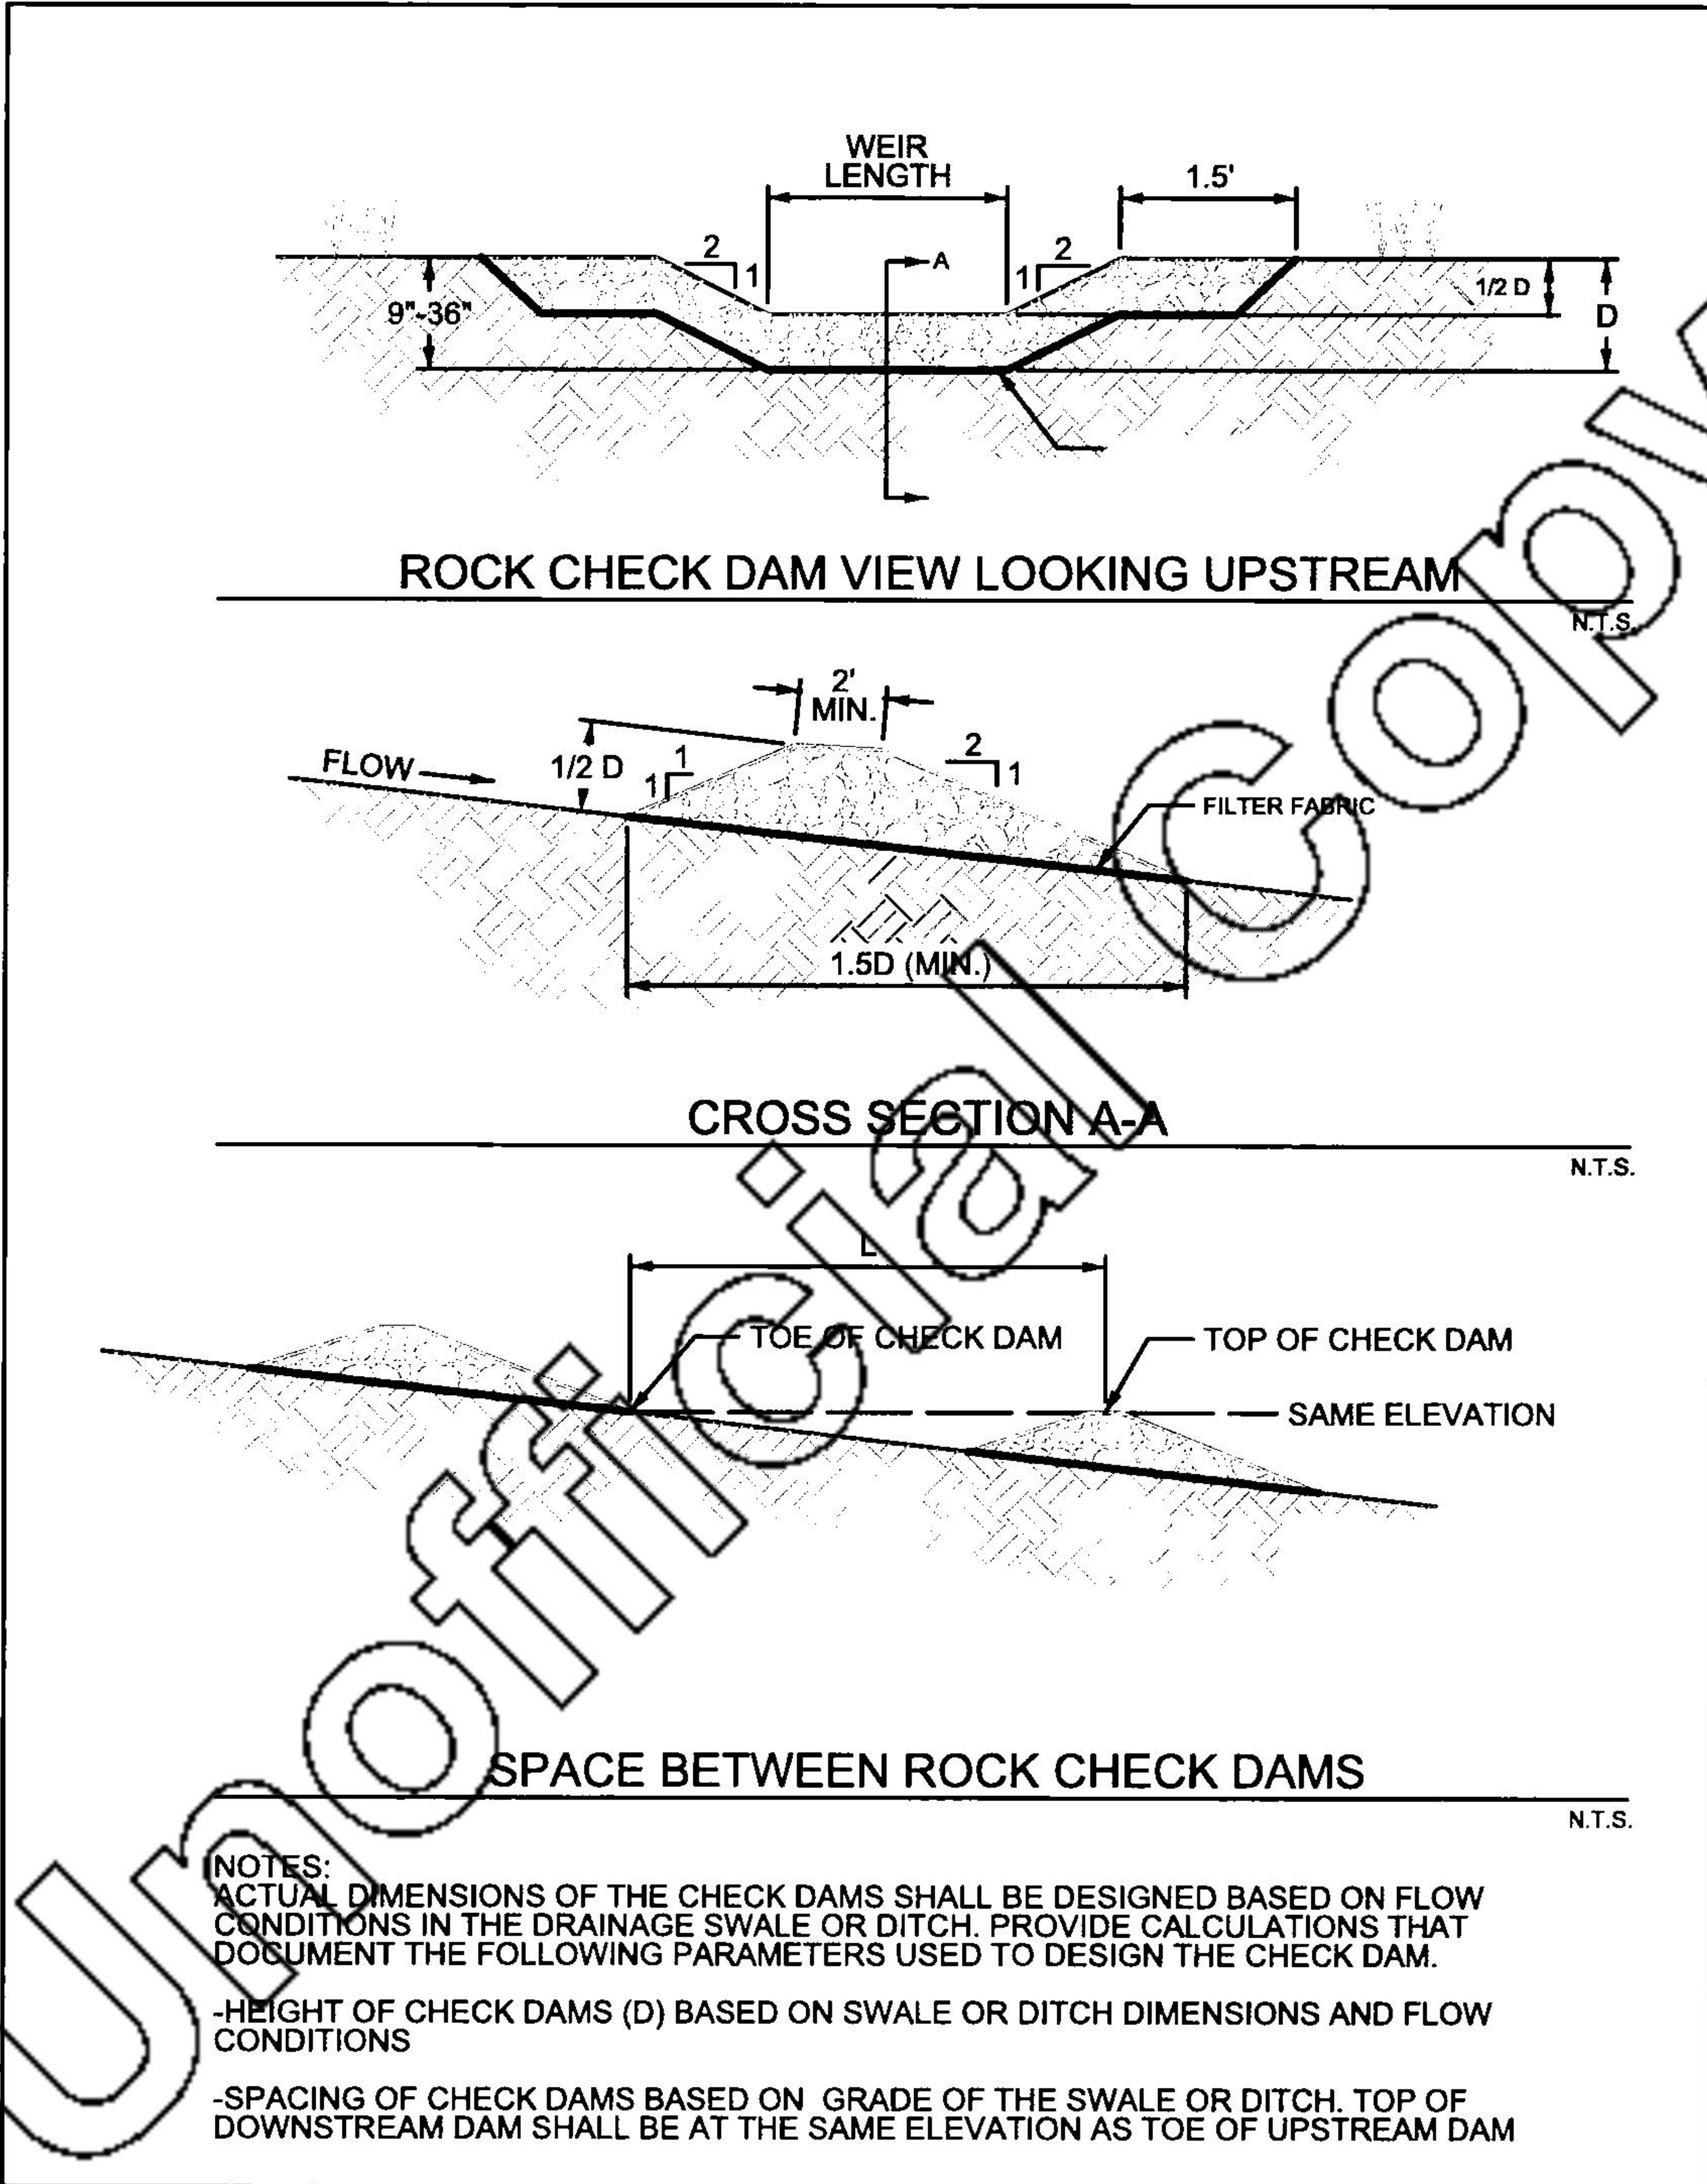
STANDARD CONSTRUCTION DETAIL - ROCK CHECK DAMS (1 OF 2)
